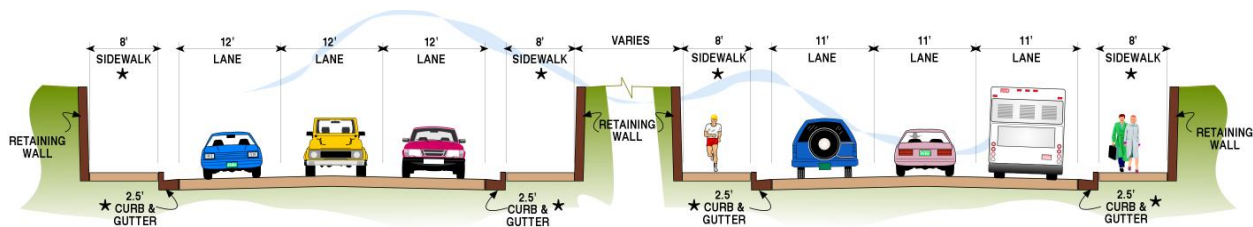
System Alternative 1, Santa Fe Drive and Kalamath Street Typical Section
